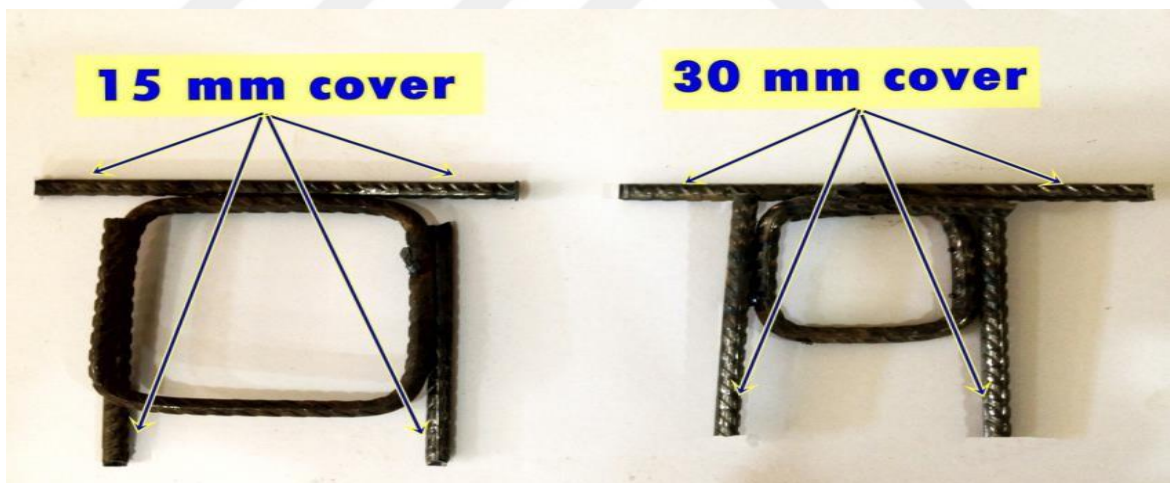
The Effect of Concrete Cover on Steel Reinforcing Ties.
